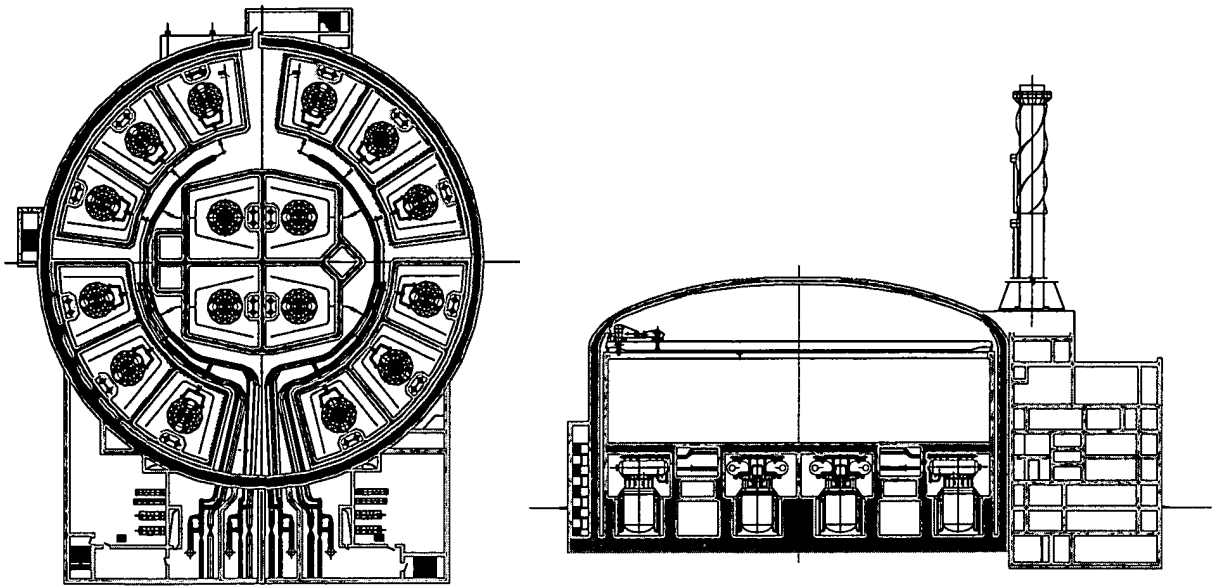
A plan and a longitudinal section of the SVBR-1600 reactor compartment's main building with the NSSS
